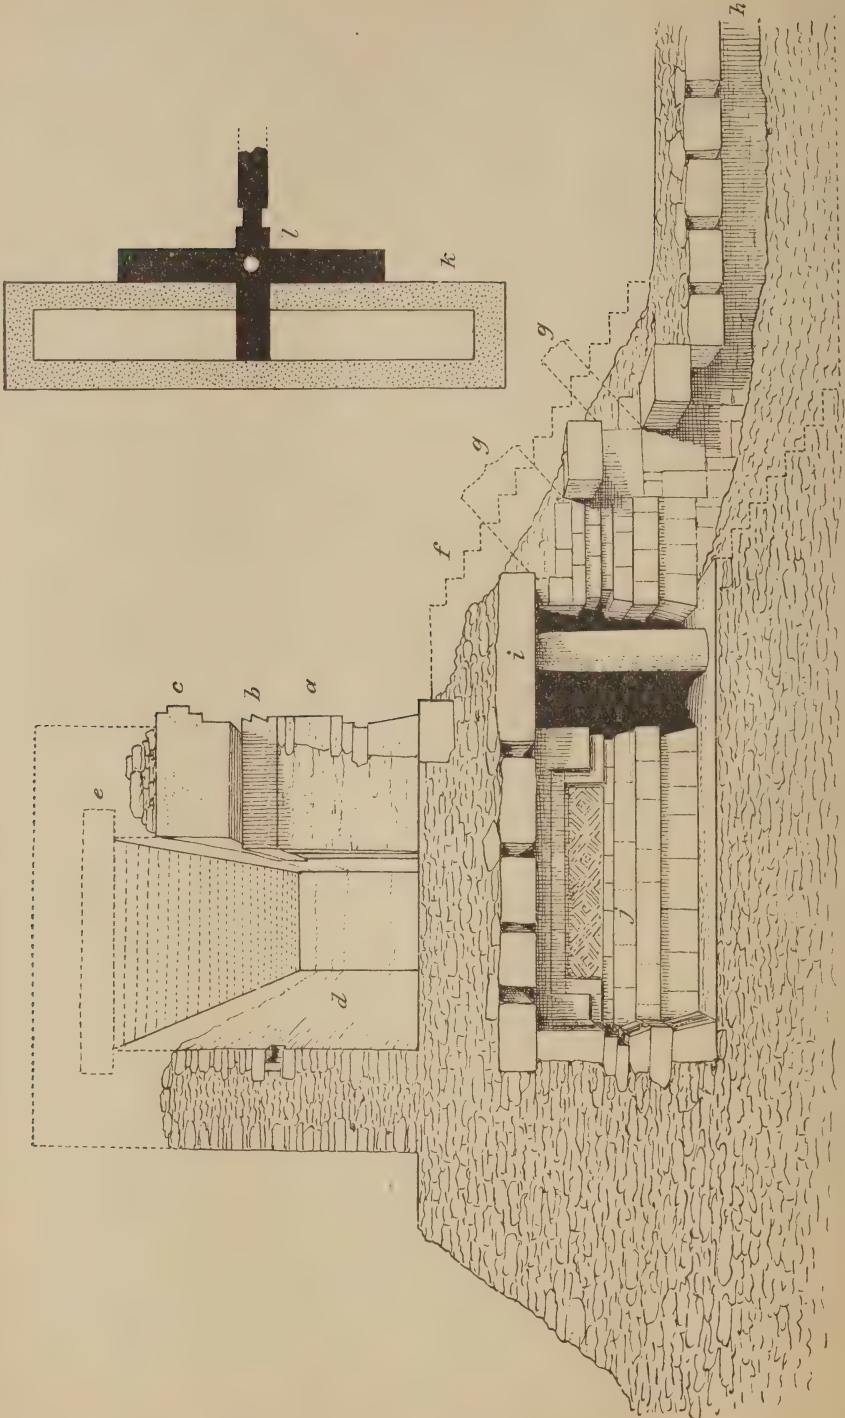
SECTION AND PERSPECTIVE OF THE BUILDING OF THE BASEMENT GALLERIES.
